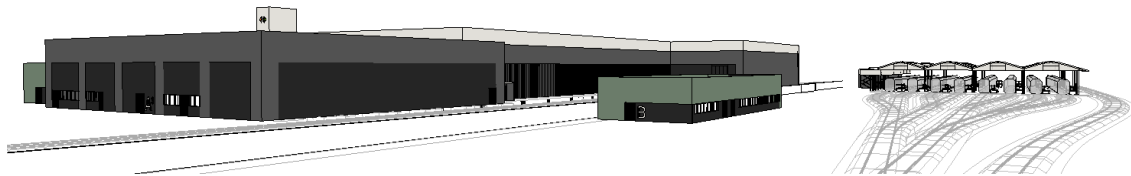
General View - Main Building, Drivers Facilities and Stabling Area
